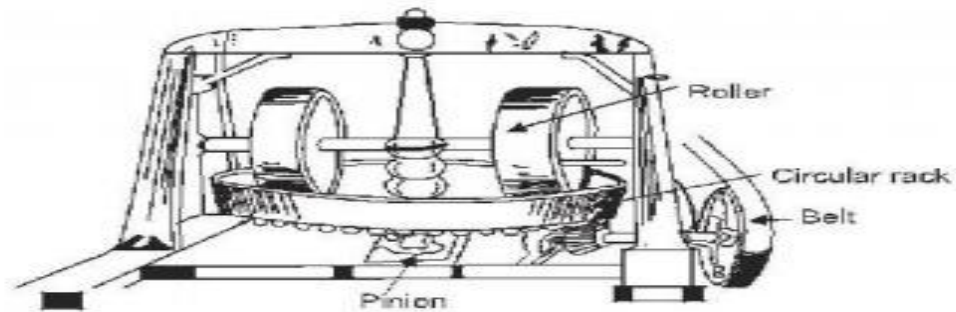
Power Driven Mortor Mill (Pan Mill)
